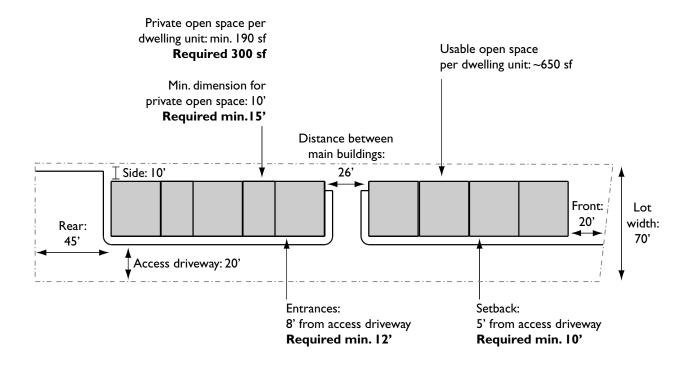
19505 MEEKLAND AVENUE PLAN
